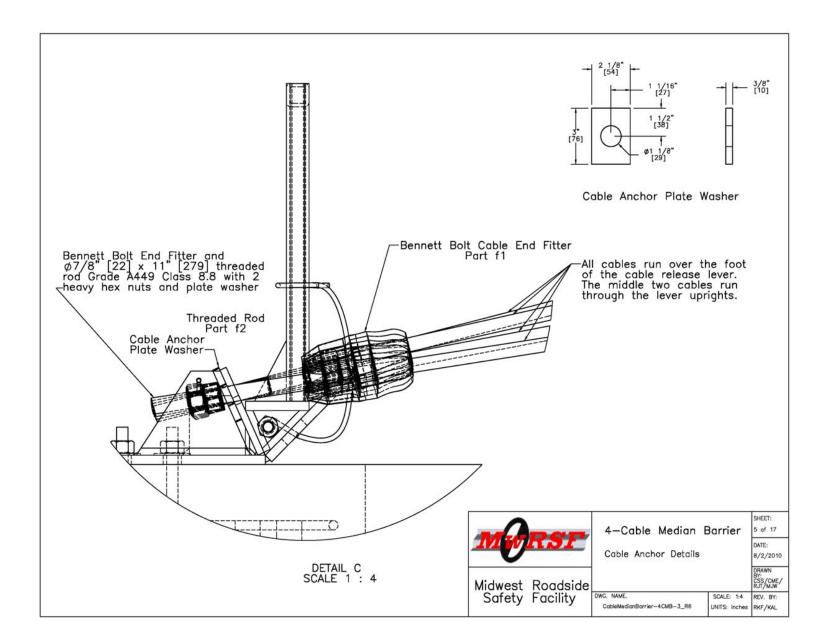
Cable Anchor Details, Test No. 4CMB-3
